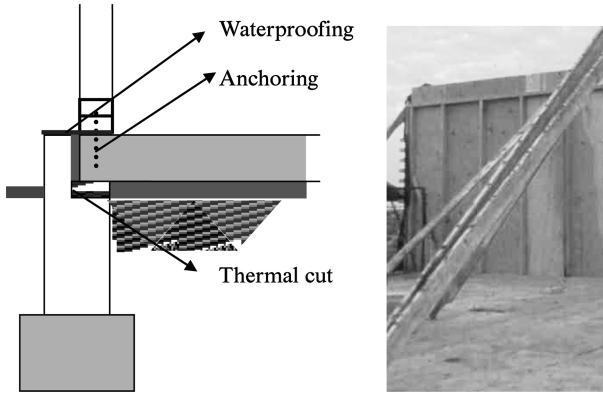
Timber-framed construction, anchoring in the foundation walls.
